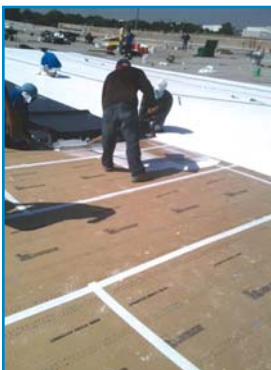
Fully adhered single ply over finished Loadmaster assembly on a low-sloped roof.
